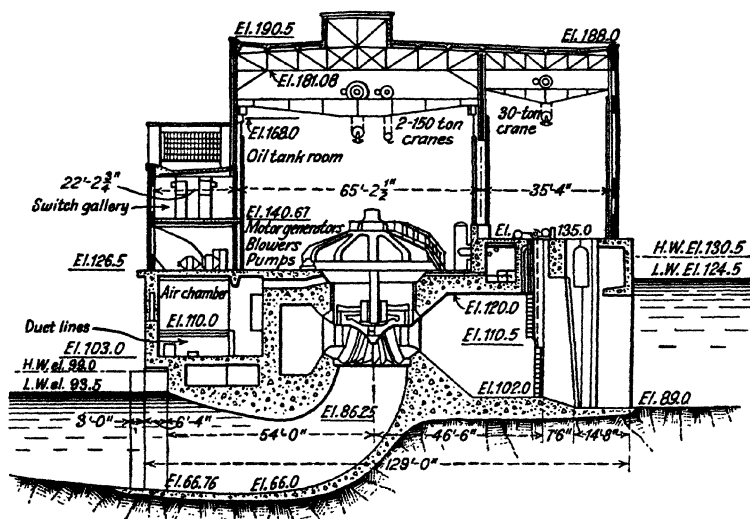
Cross Section of Cedar Rapids Power House Having a Concrete Superstructure.
